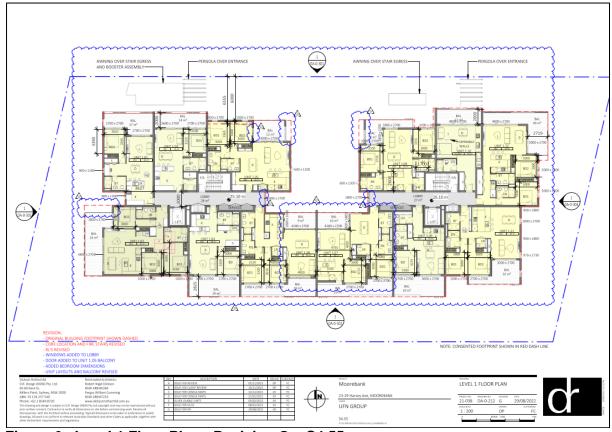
Level 1 Floor Plan - Revision G - S4.55
